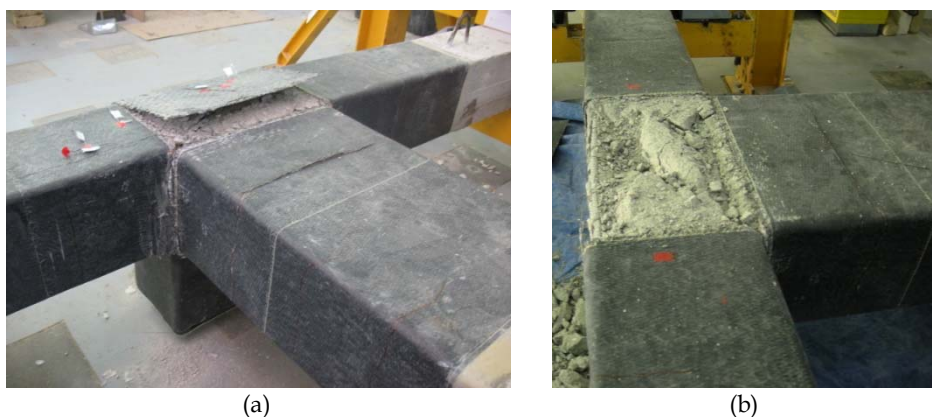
T_FS2: failure mode a); crack pattern after FRP removal b)
